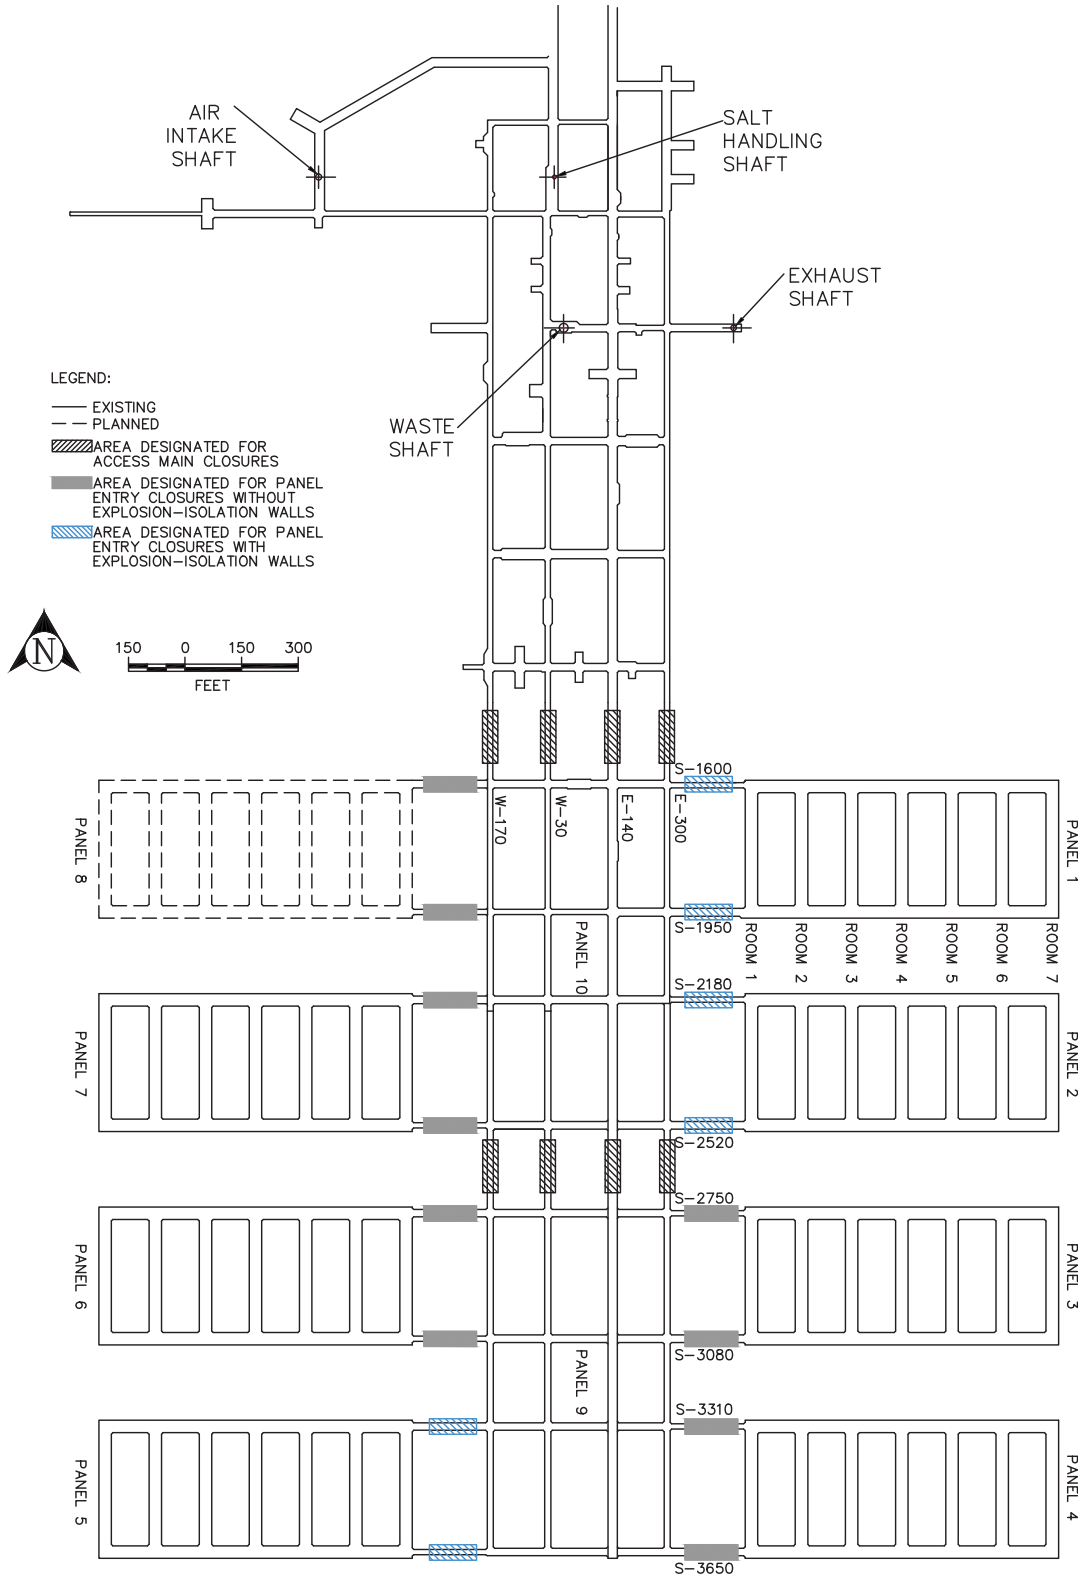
W-214-W Underground Facilities Typical Disposal Panel
